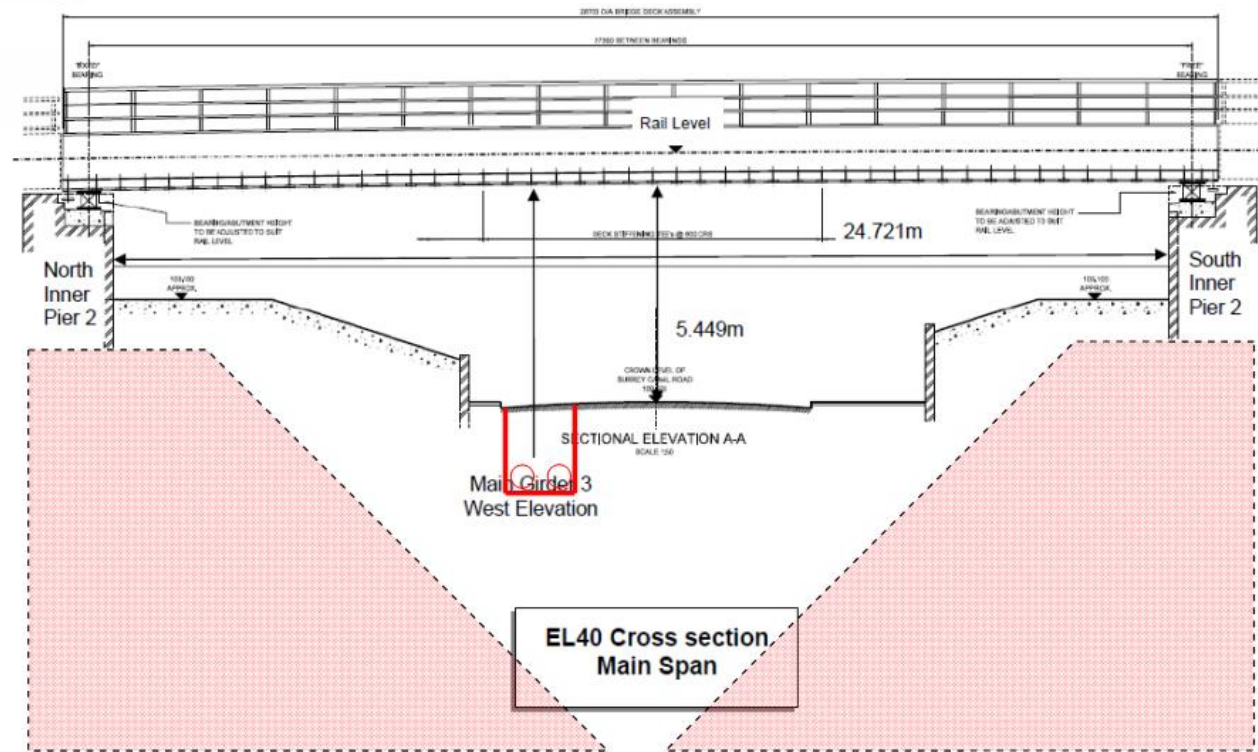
Extract from TfL Detailed Examination Report potential influence zone of bridge abutments
